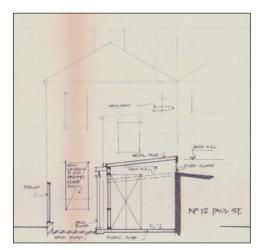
Section plan of southern elevation. J. Greenwood (1984). Inner West Council Archives
